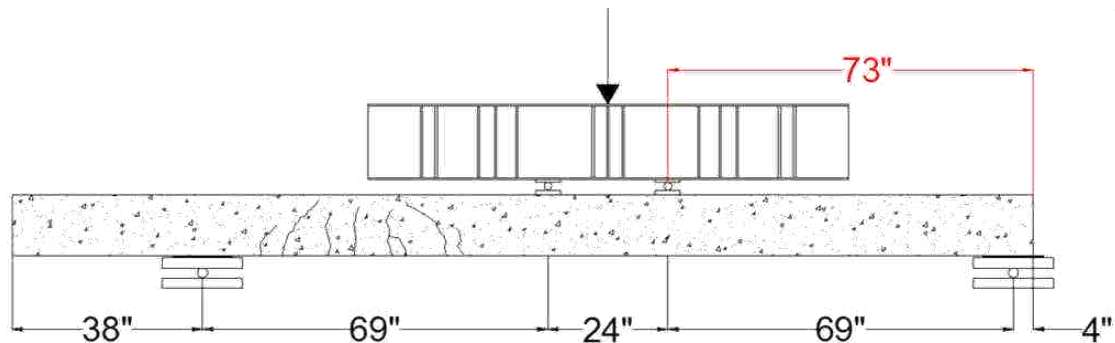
73 in. (1,854 mm) Embedment Length Test Setup
